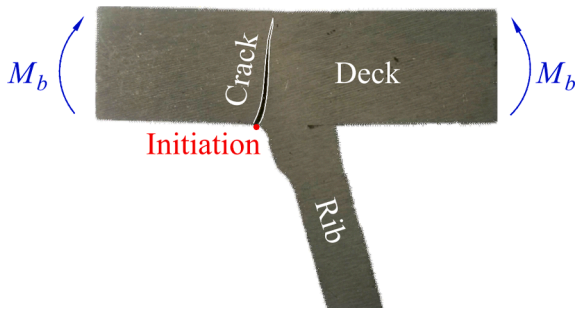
Fatigue cracking pattern of RD joints.
